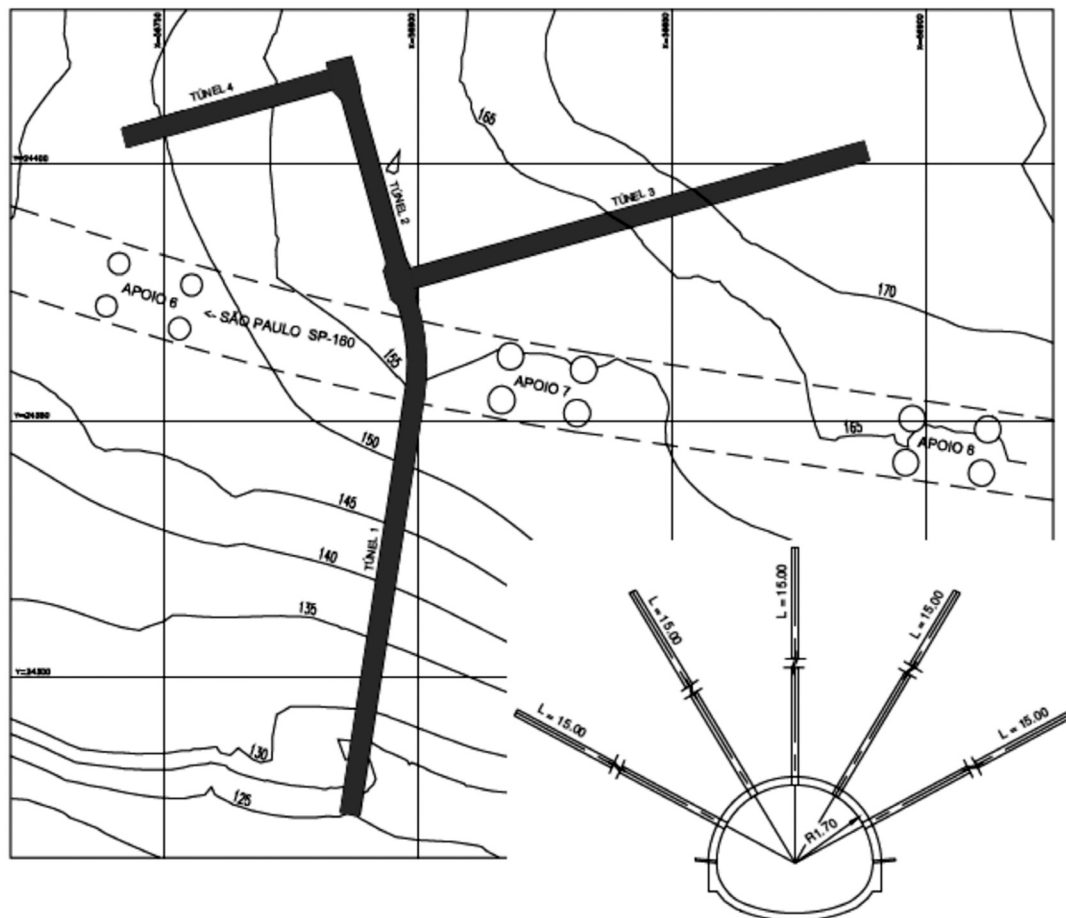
Plan view and tunnel cross section of the VA-19 drainage tunnel (Wolle *et al.*, 2004).
